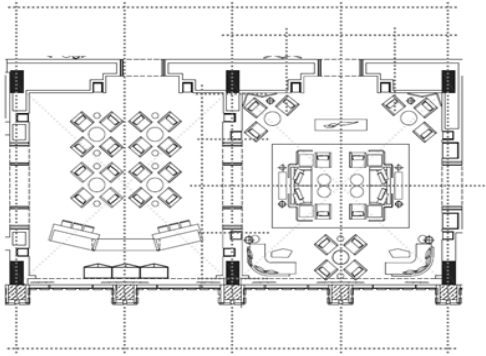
The layout plan of Beijing Waldorf Astoria Hotel Chinese Restaurant.
